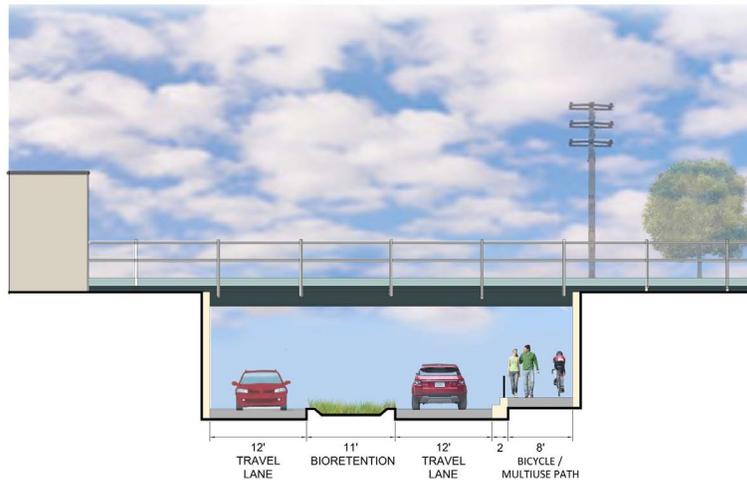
8th Street Underpass (8th Avenue to 7th Avenue)
